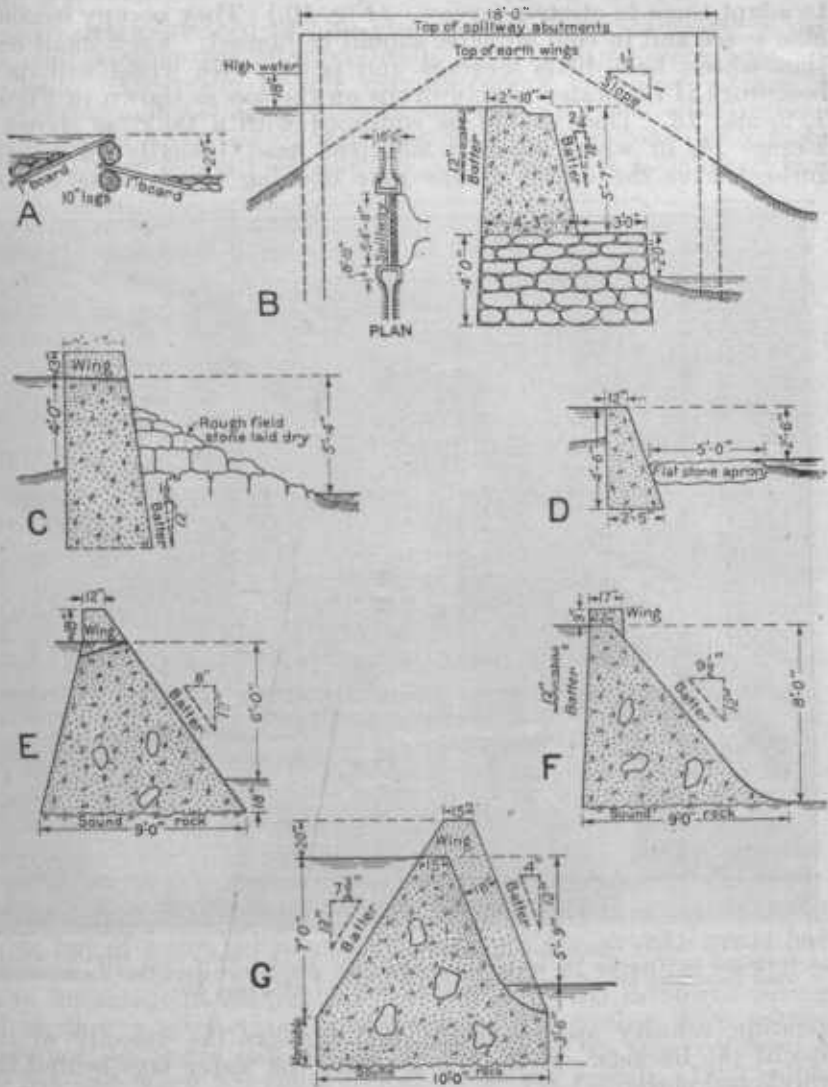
Cross sections at the spillways of typical farm dams: A, Simple log and board dam for diverting a small flow into a headrace. B, Old earth milldam 335 feet long and having a concrete and rubble spillway 54 feet 8 inches long; the original spillway, 36 feet long, was too small and part of the dam was washed away. C, Dam shown in Figure 3. D, Simple concrete diversion dam with stone apron to prevent undermining by the overflow. E, Concrete dam 125 feet long founded on rock. F, Dam shown in Figure 6. G, Dam shown in Figure 7
